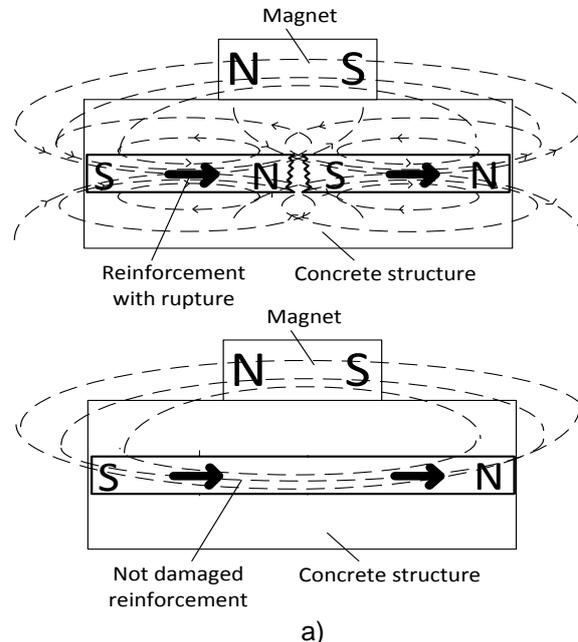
MFL testing of a ruptured reinforcement steel bar and a not damaged reinforcement steel bar:
